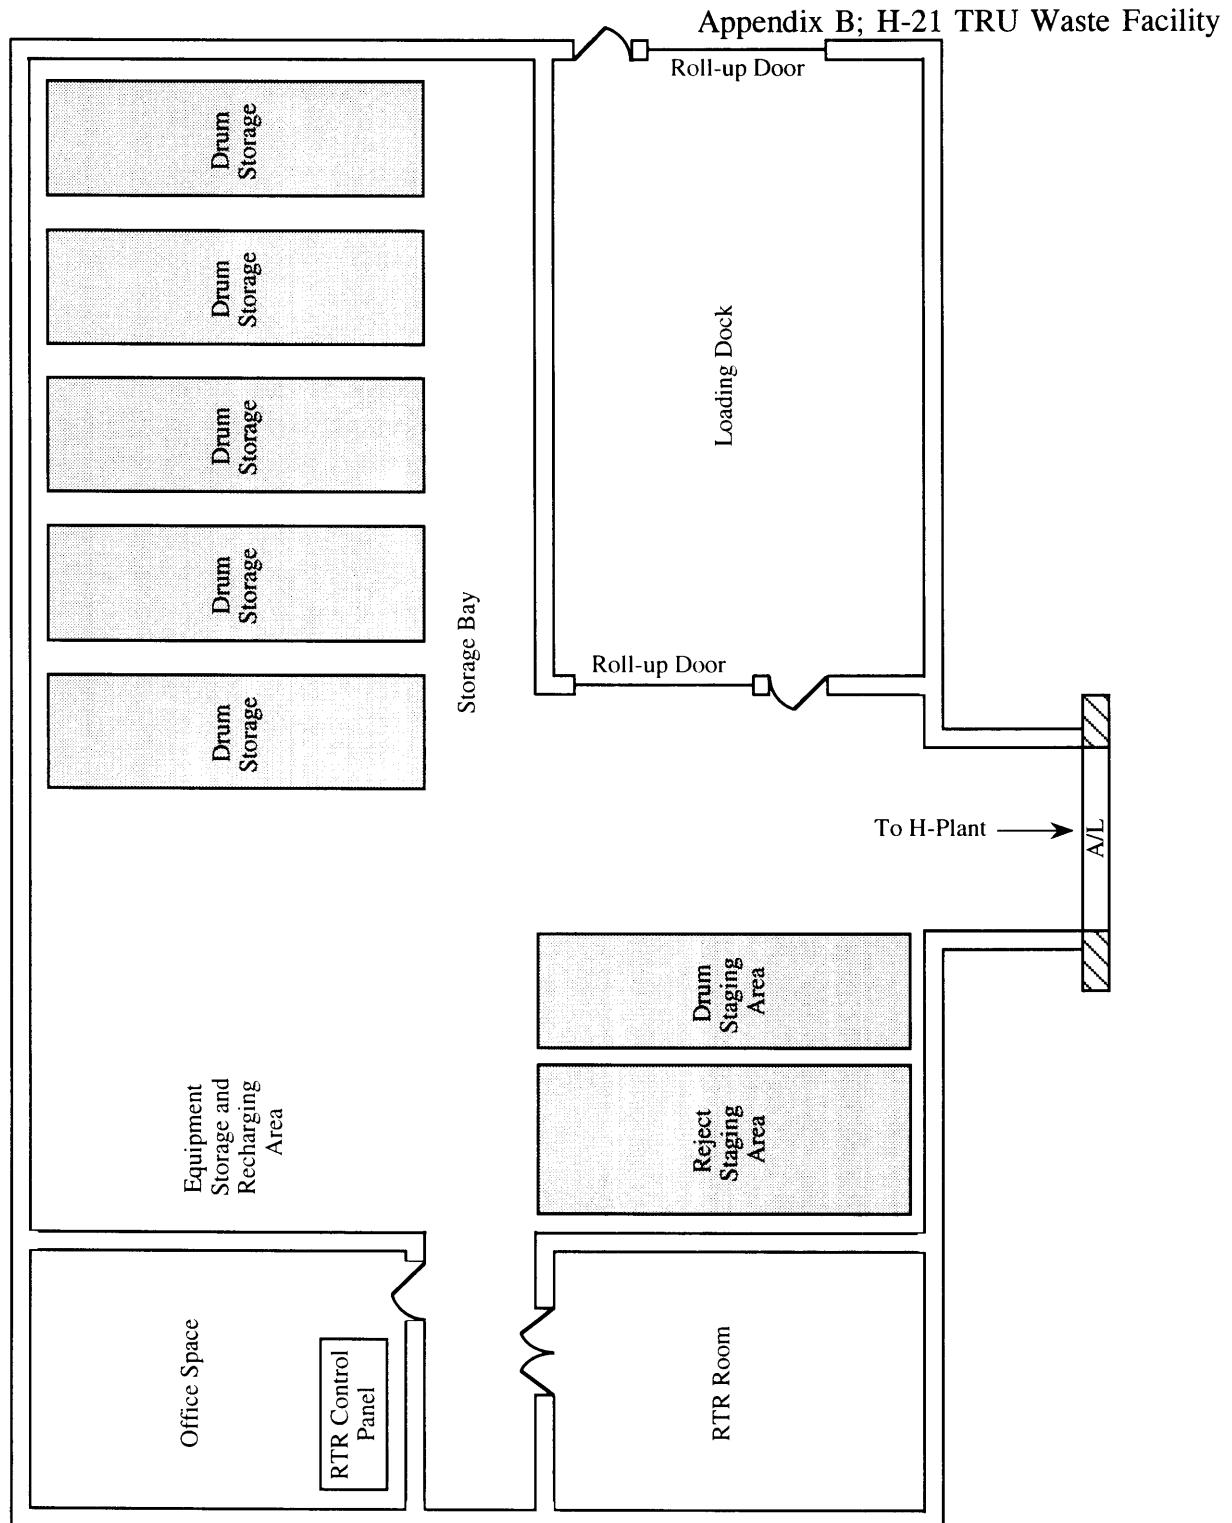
H-21 TRU-Waste Facility Floor Plan
